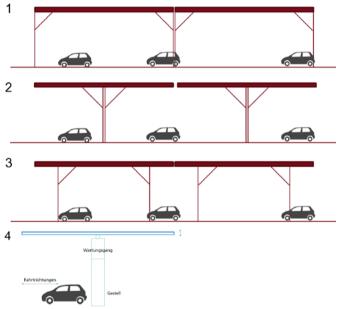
The four variants for designing the roofing in the longitudinal direction: roofing with supports in the corners (1), roofing with supports in the middle (2), roofing with cantilever with supports in the edge area (3) and a roofing that can be pivoted in the longitudinal direction (4).
